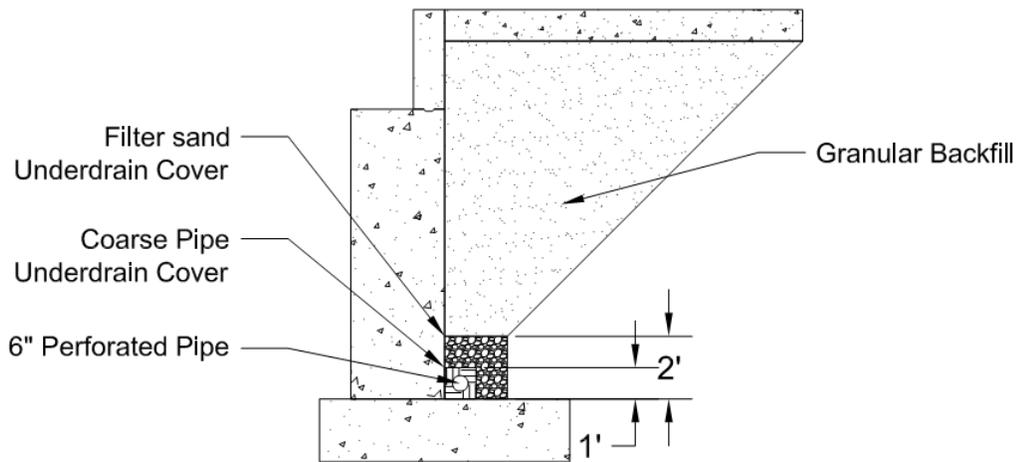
Underdrain Design, After ODOT Proposed Plan for Shields Boulevard over I-35
